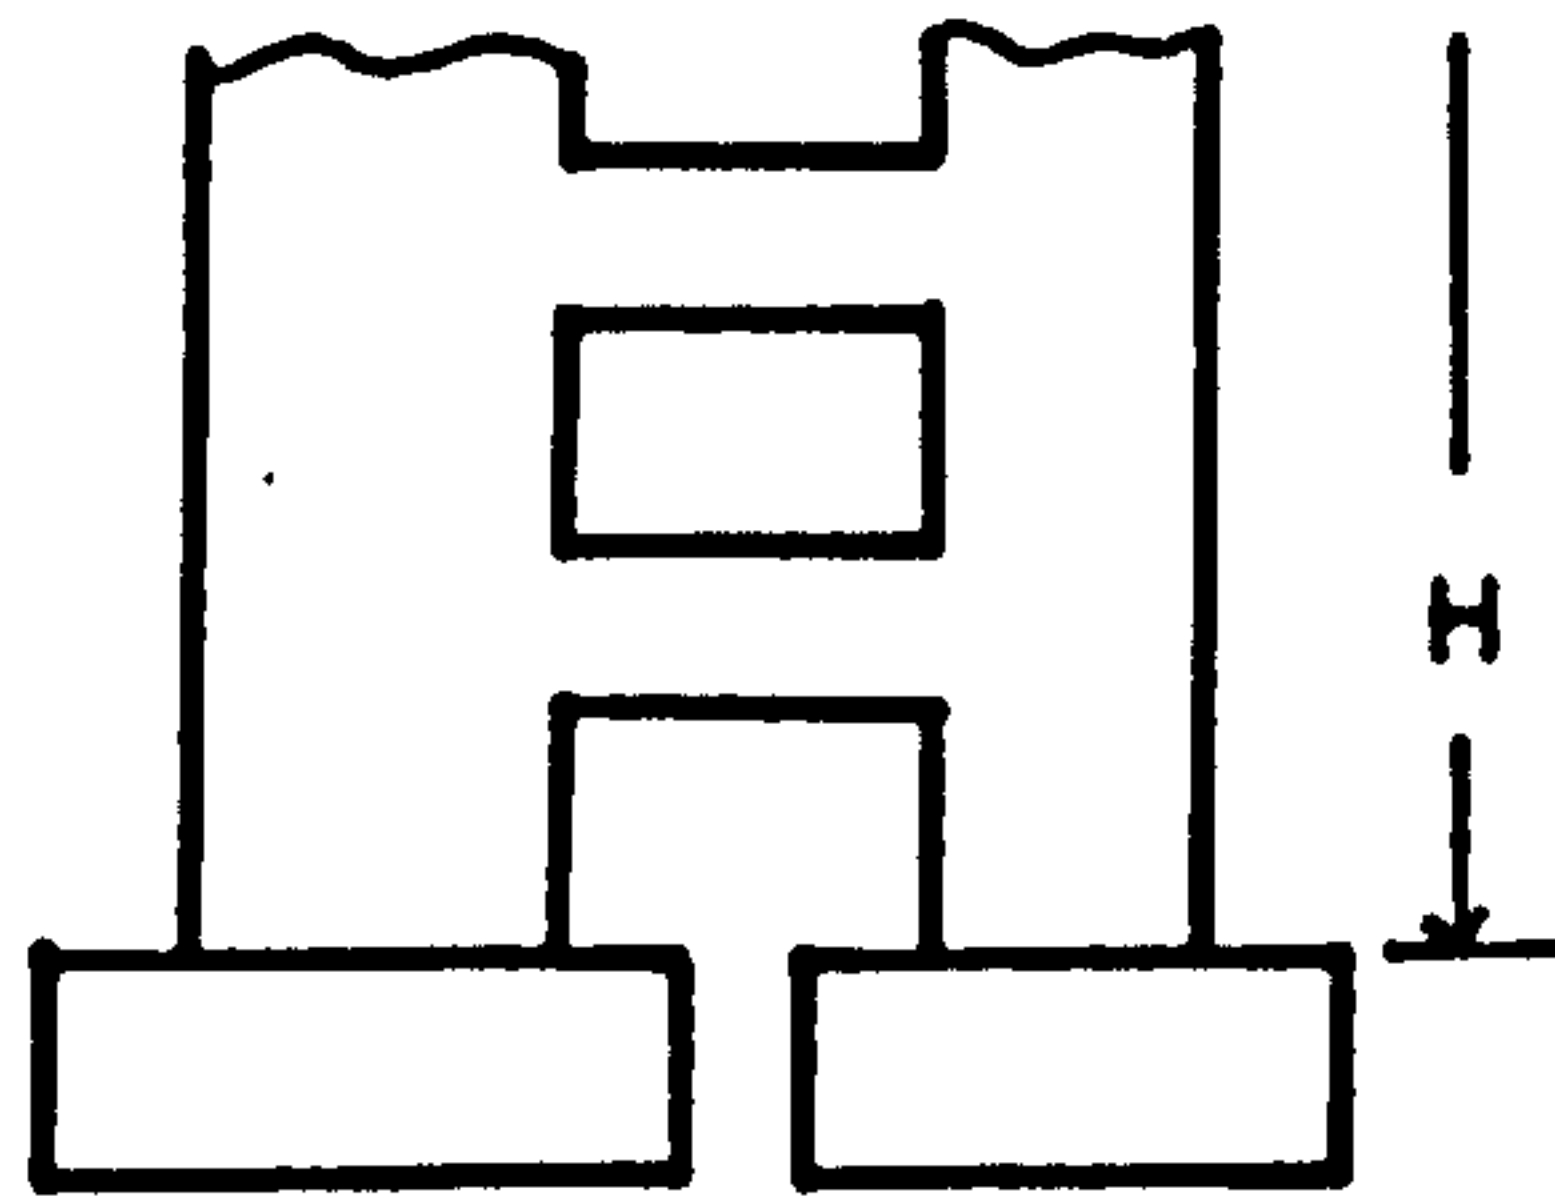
Wall whose piers are fixed in separate foundation.
